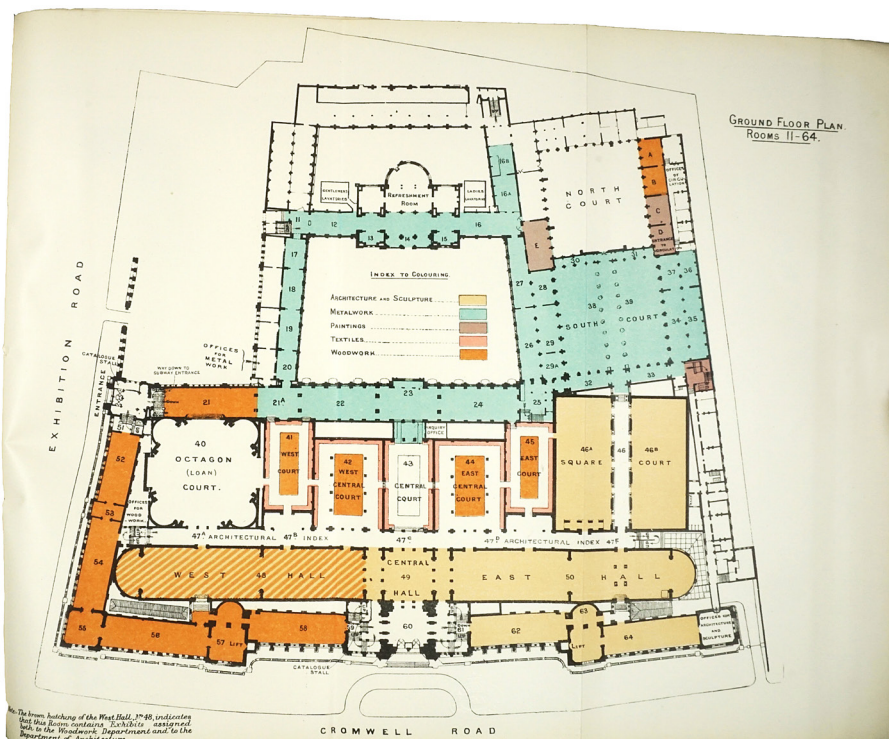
Ground Floor Plan: Rooms 11-64, from Victoria & Albert Museum (1914), *General Guide to the Collections*, London: H.M.S.O. (at 40% actual size, sheet size 315mm x 245mm)
